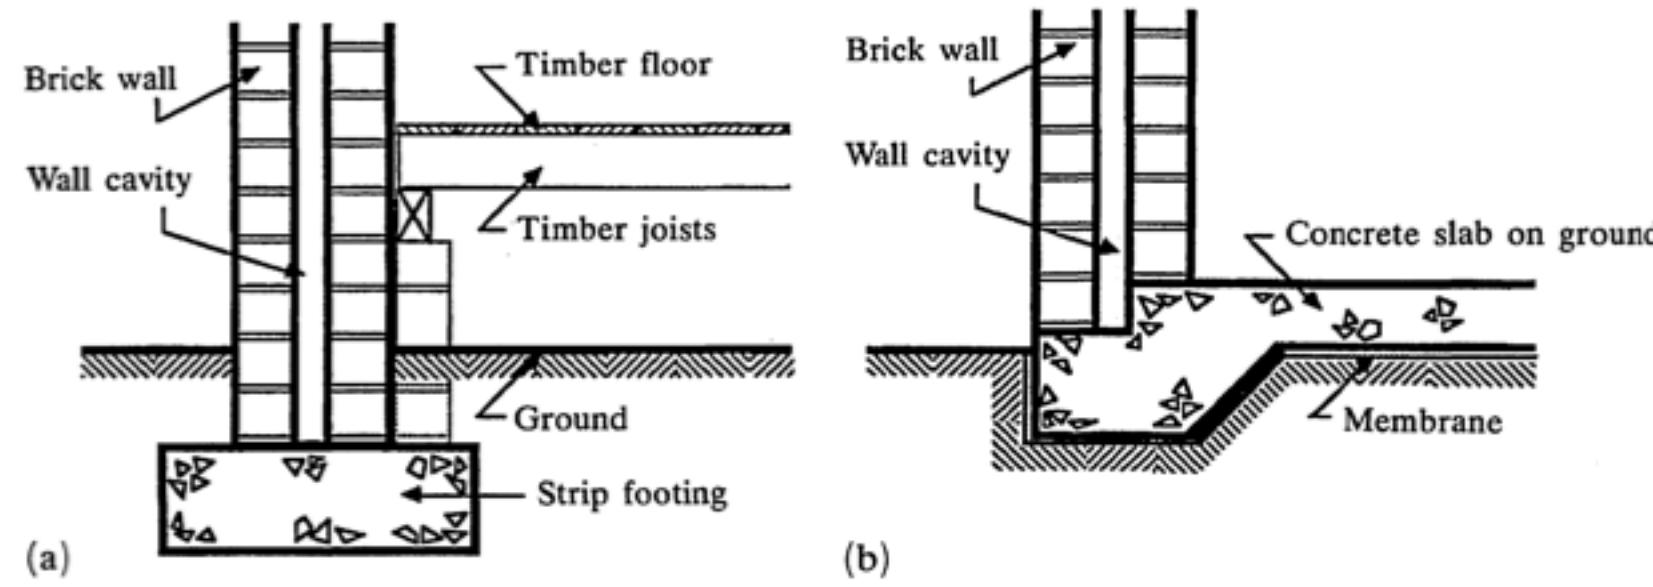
Examples of subfloor construction details: (a) raised timber floor and (b) concrete slab on ground.
